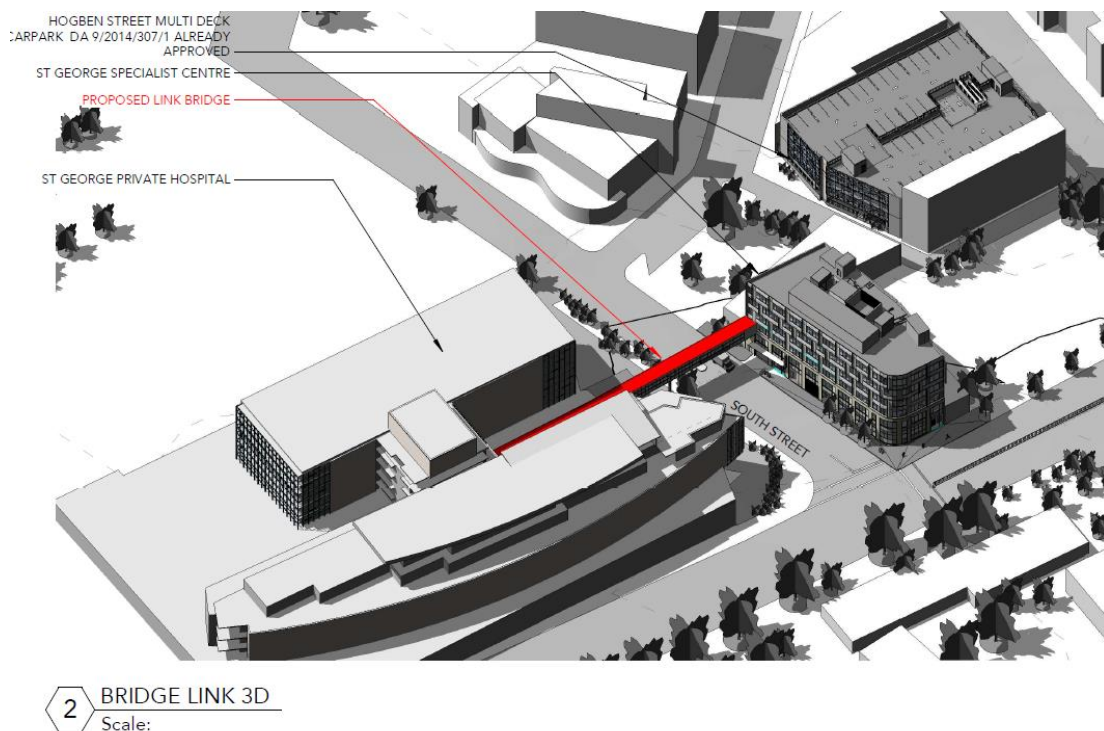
Proposed pedestrian bridge link (Source: Architectural plans prepared by Team 2 Architects, 2017)
